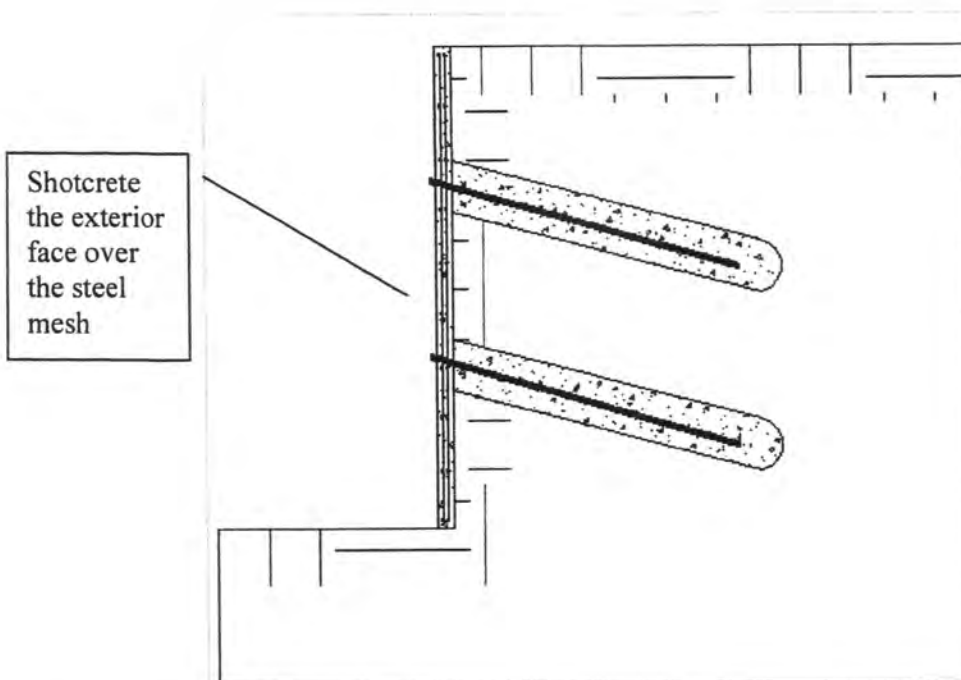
Picture showing step 7 of the construction process of Soil Nail wall
